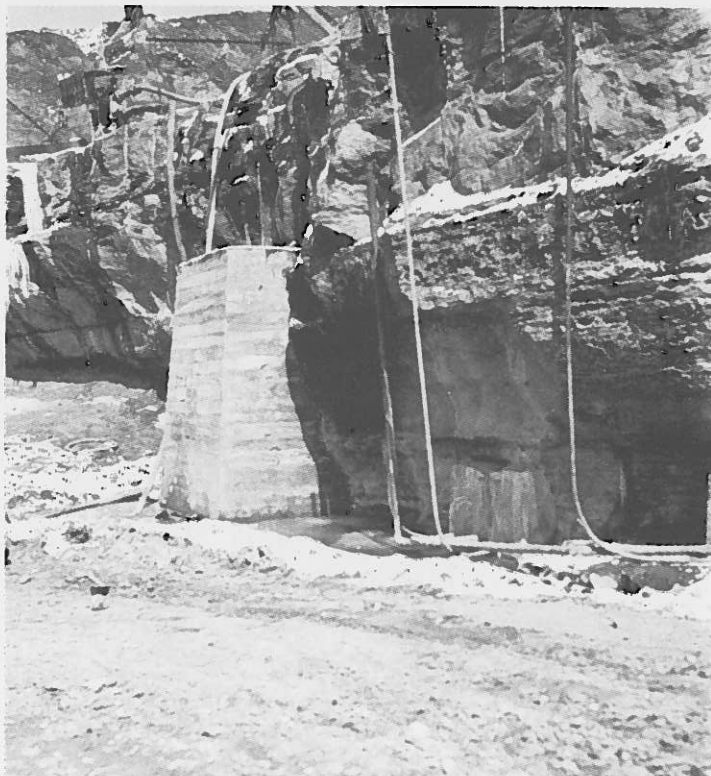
VIEW LOOKING DOWNSTREAM OF CONCRETE PLUG COVERING CAVITY IN CUTOFF TRENCH.
